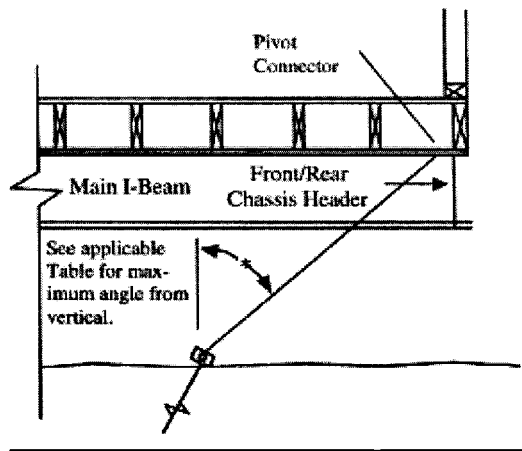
Connection to front or rear chassis headers. Strap must be installed within 12" of where the header member connects to the main I-beam.
